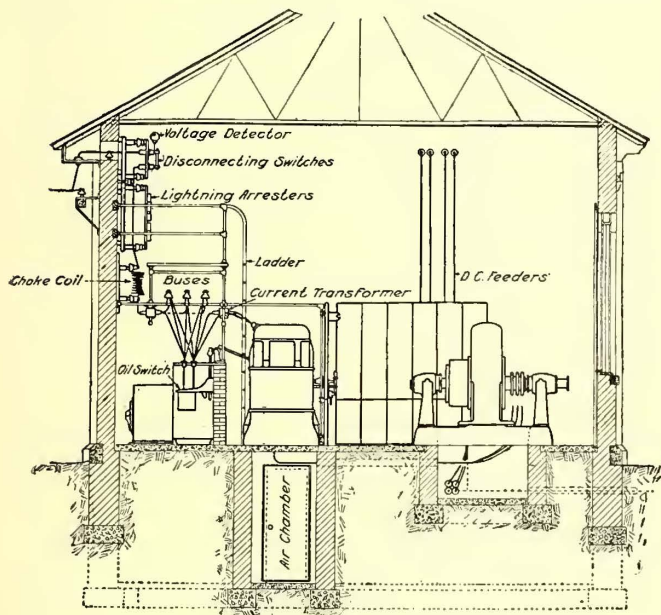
Converter Substations—Typical Arrangement of Apparatus in Substation with Distributed Switching
